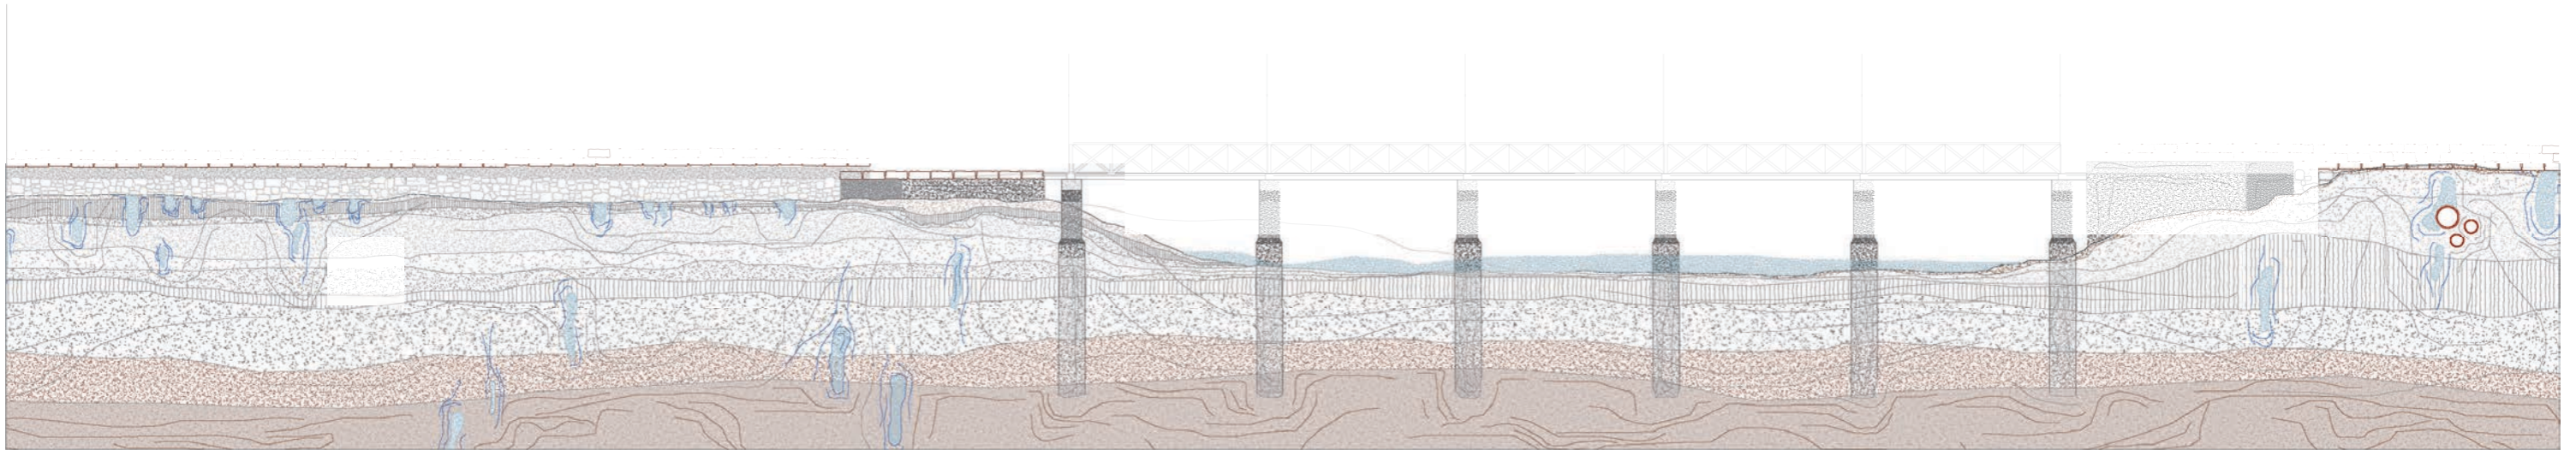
, Author, "Raising the Causeway Sides Elevation Study", Drawing, 2022
